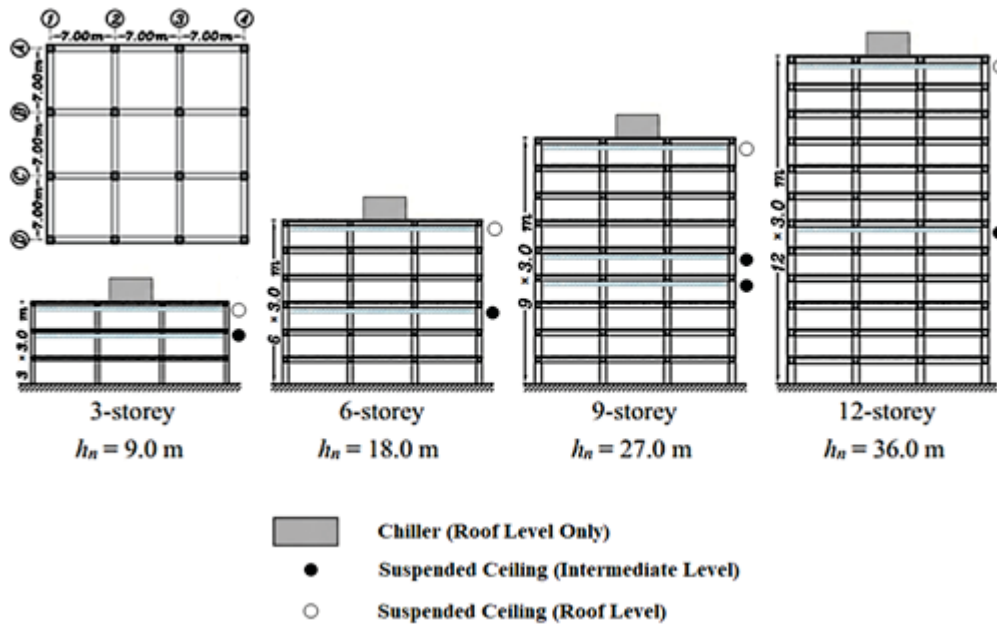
Elevation and typical plan views of the 3-, 6-, 9-, and 12-storey archetype buildings (adapted from Mazloom and Assi (2022)), indicating the specific locations of the investigated non-structural components: chillers (roof level only) and suspended ceilings (intermediate floors 2, 3, 4-5, and 6 for the 3-, 6-, 9-, and 12-storey buildings, respectively, plus all rooftop levels).
